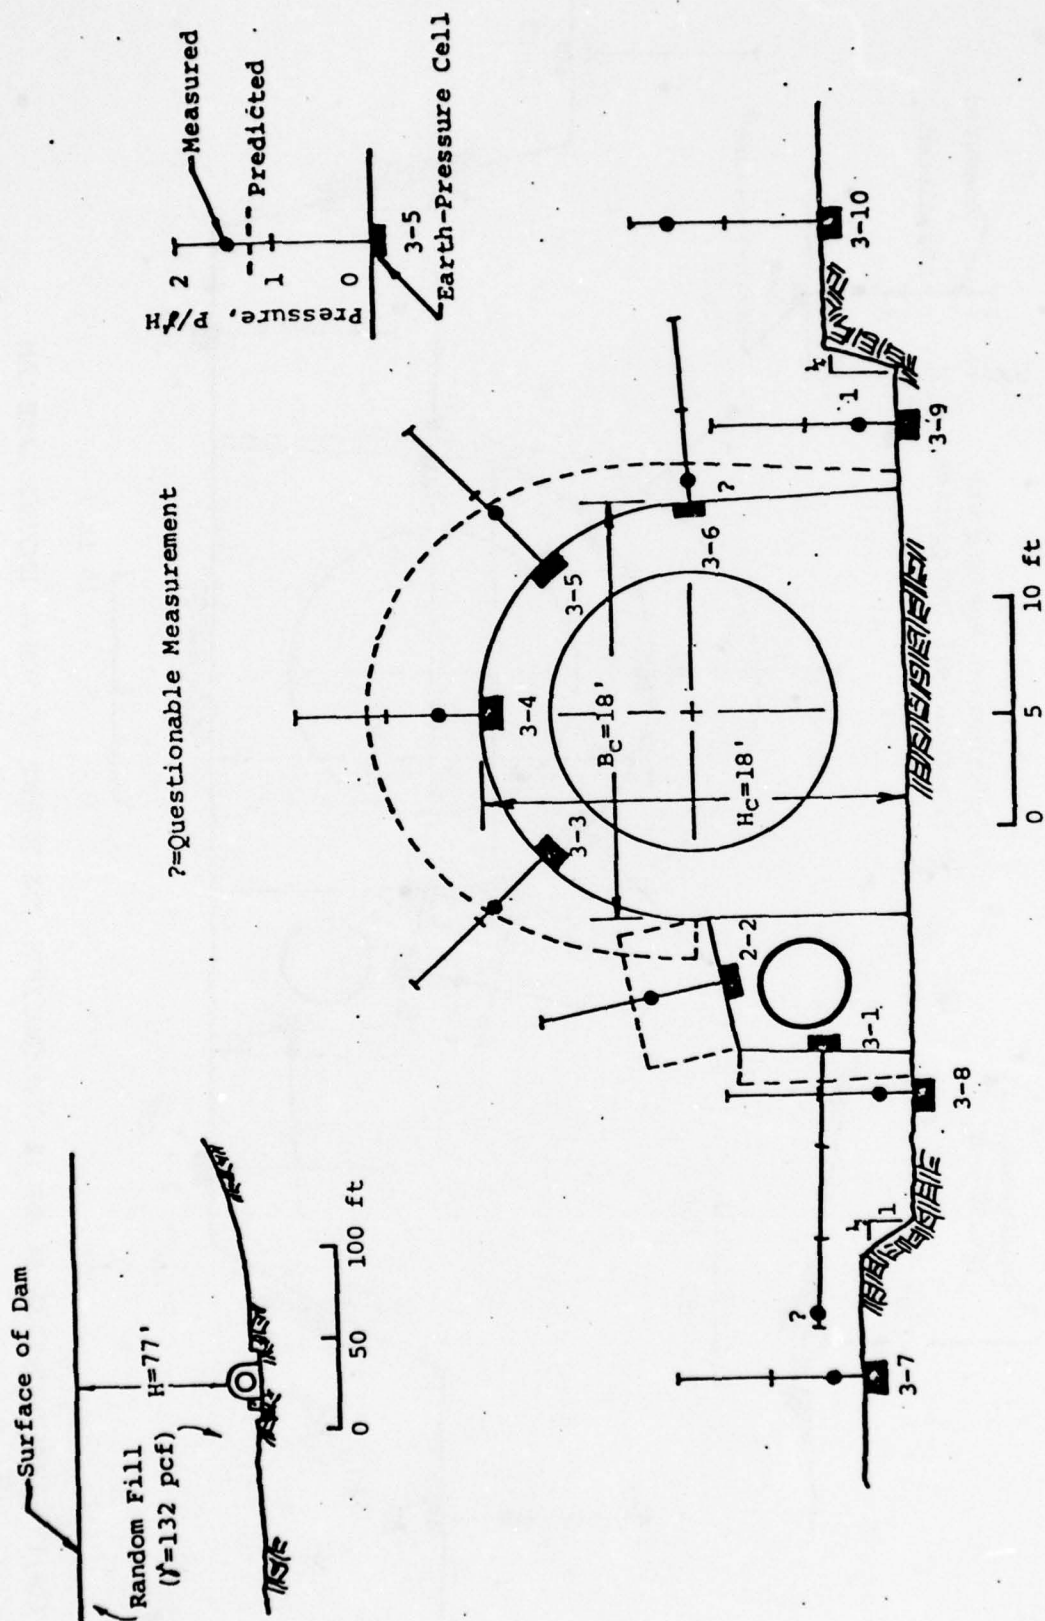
EARTH PRESSURES AT END OF CONSTRUCTION, INSTRUMENT STATION B, DEQUEEN LAKE DAM
